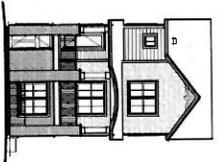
EXHIBIT WILL BE PROVIDED WITH FIRST PERMIT SUBMITTAL SHOWING PRE-PLAN OF TOWNHOMES, DUPLEXES AND SPD 3-STORY HOMES TO MEET ANTI-MONOTONY.
